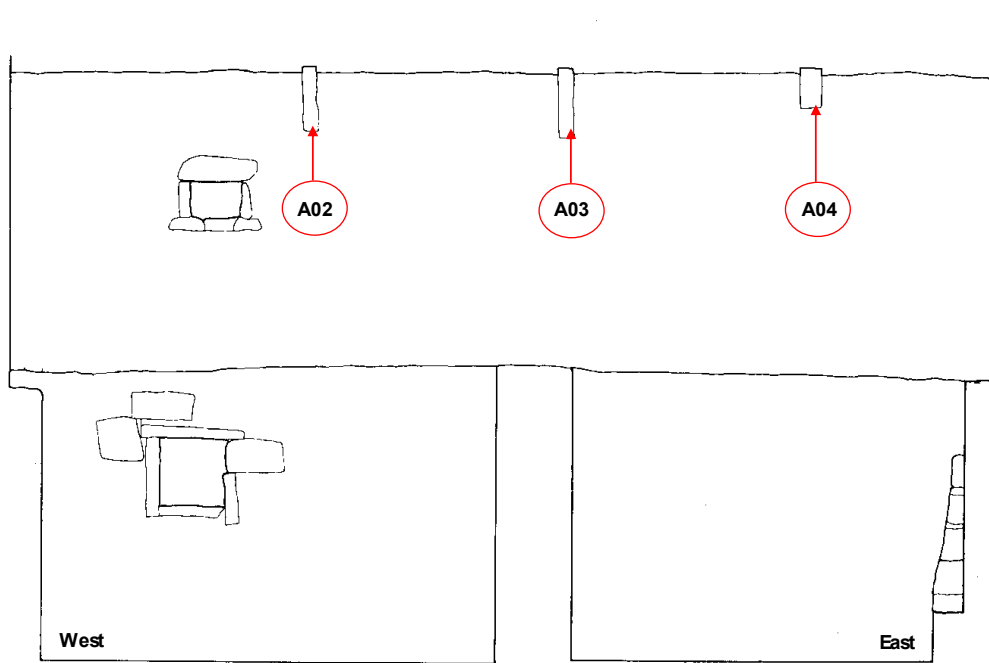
Drawing of north wall interior to show sample locations (after Plowman Craven & Associates, architects)
